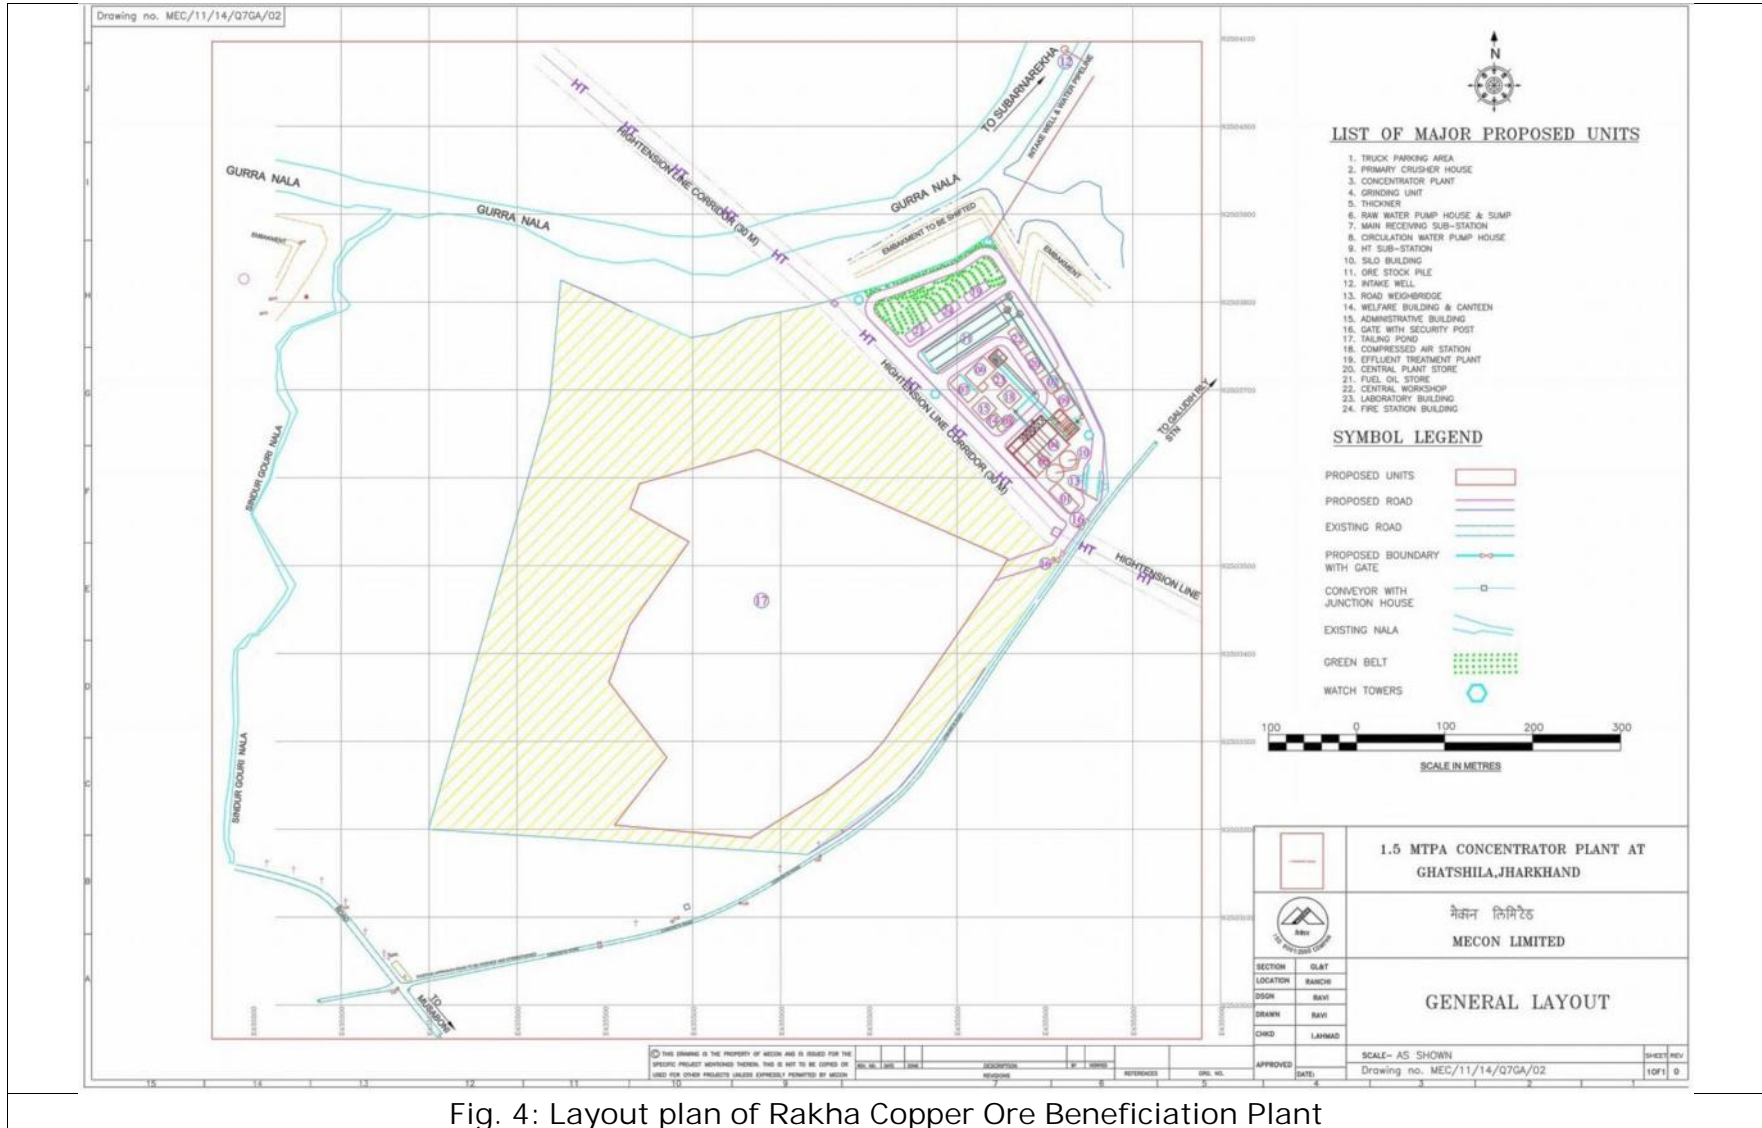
Layout plan of Rakha Copper Ore Beneficiation Plant
